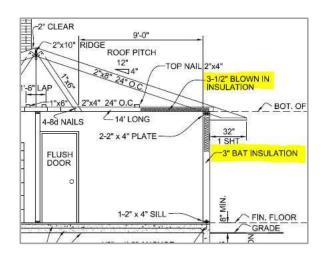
Excerpt from "Levittowner" Drawing (Levittown Archive)
